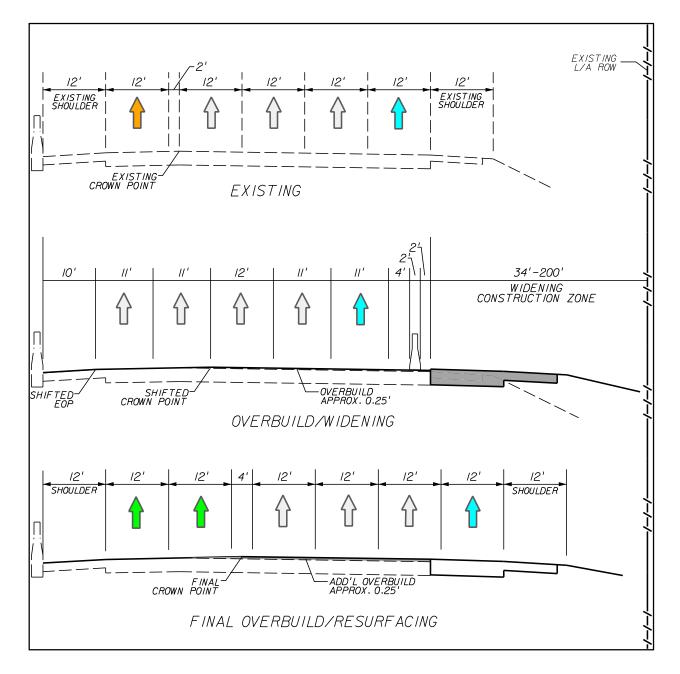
Maintenance of Traffic Typical Section (Mainline Widening with Existing Auxiliary Lane)
